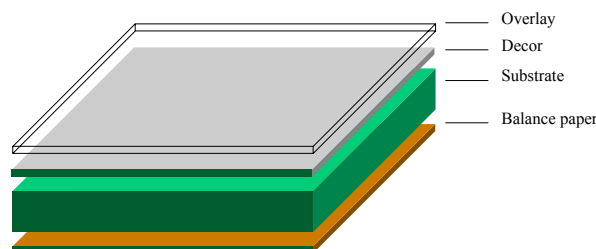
Typical components of Laminated Flooring (3-layer structure).
